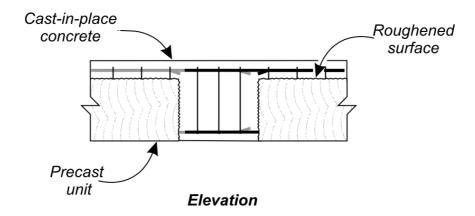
Beam-to-beam connection using non-contact straight bar laps
